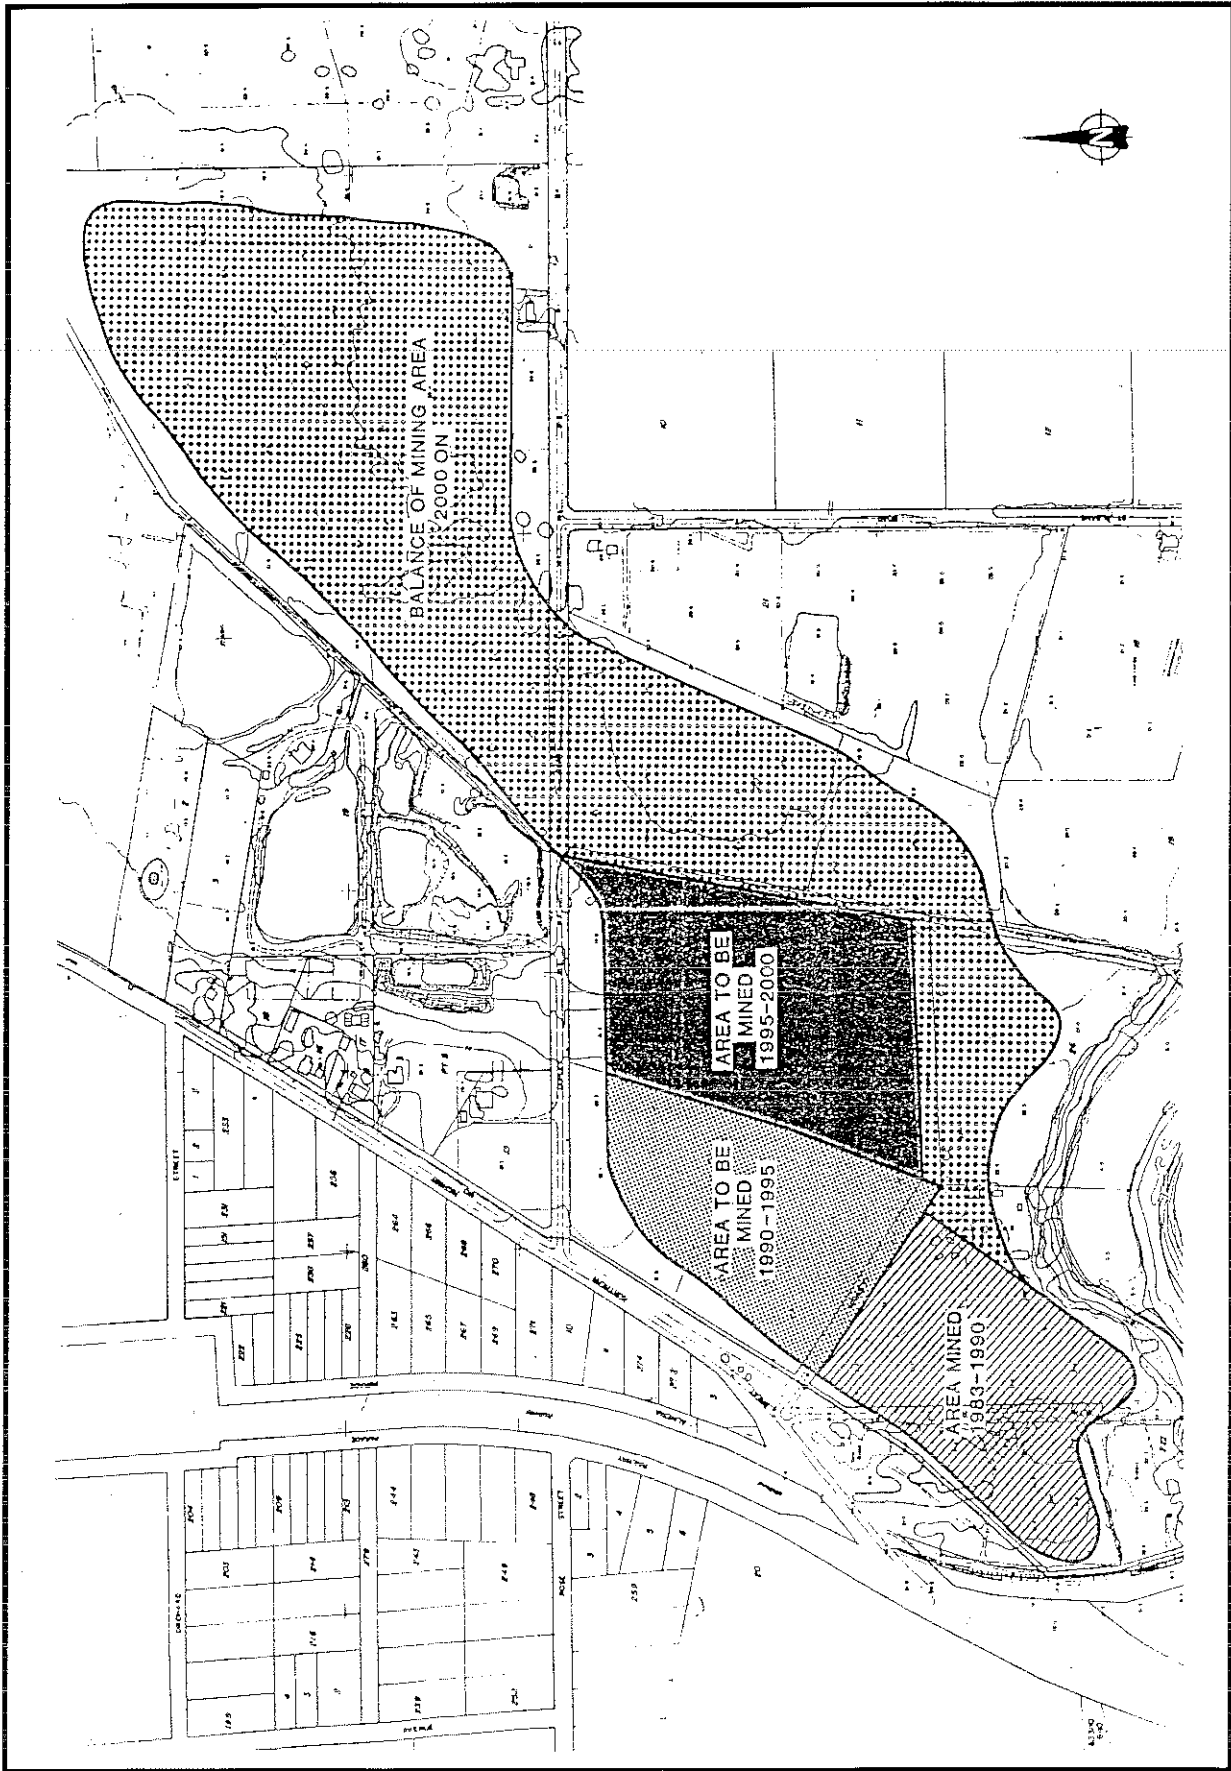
Staging plan for clay excavation, corner of Hallett and Copley roads
